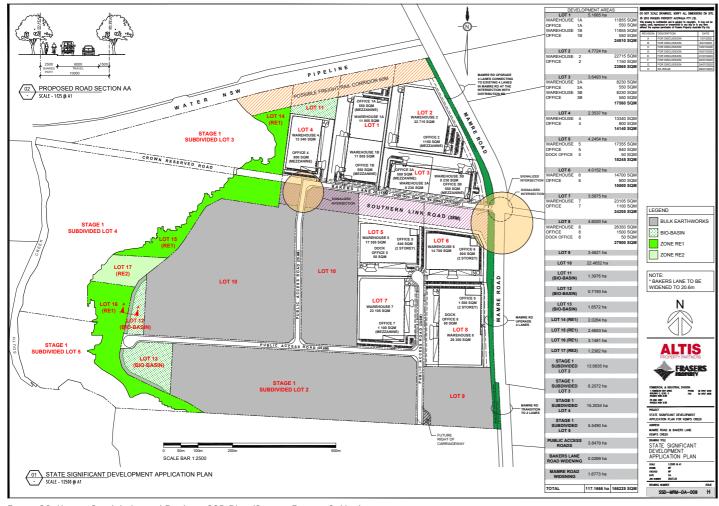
Kemps Creek Industrial Facility - SSD Plan (Source: Frasers & Altis)
